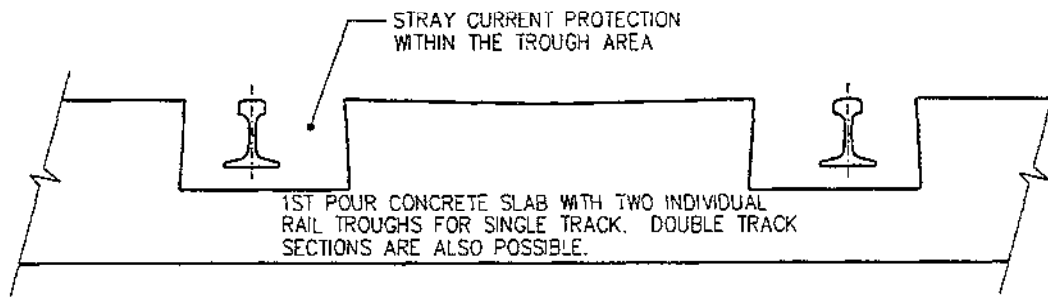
Concrete Slab with Two Individual Rail Troughs
